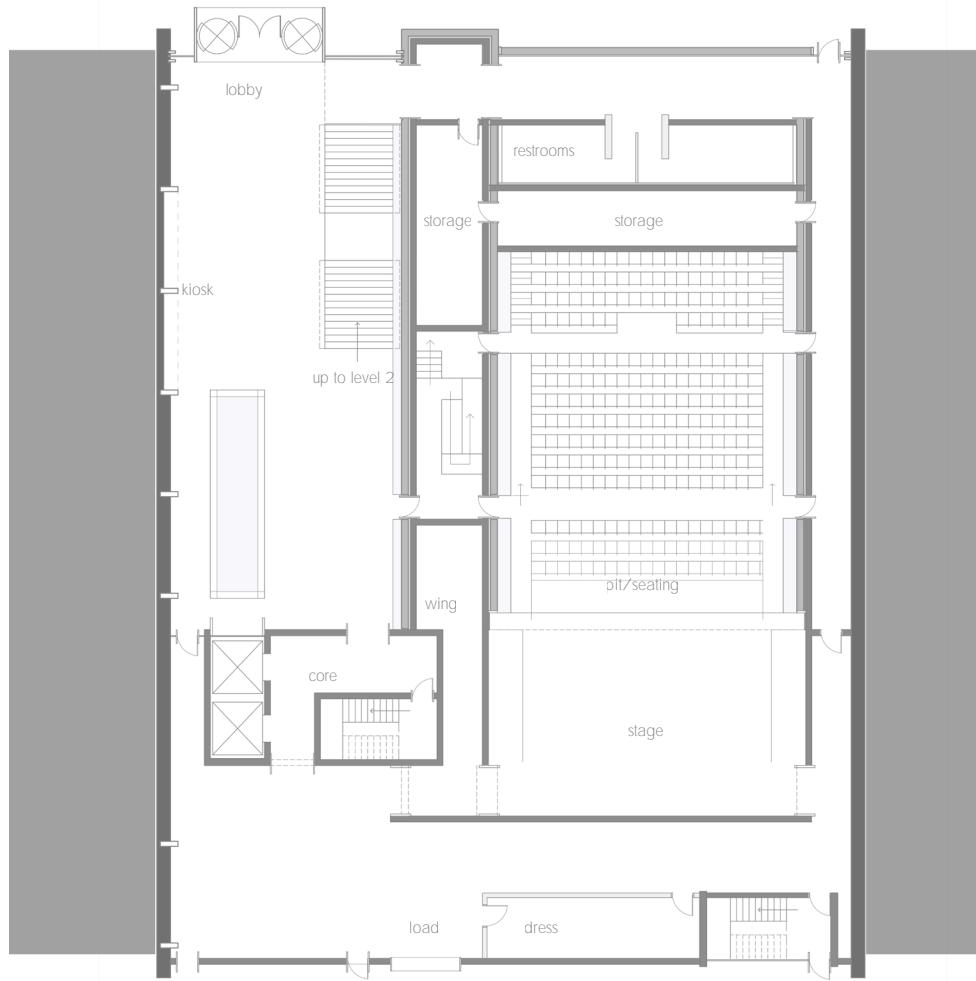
ground floor plan - oriented to correspond to fig. 7
